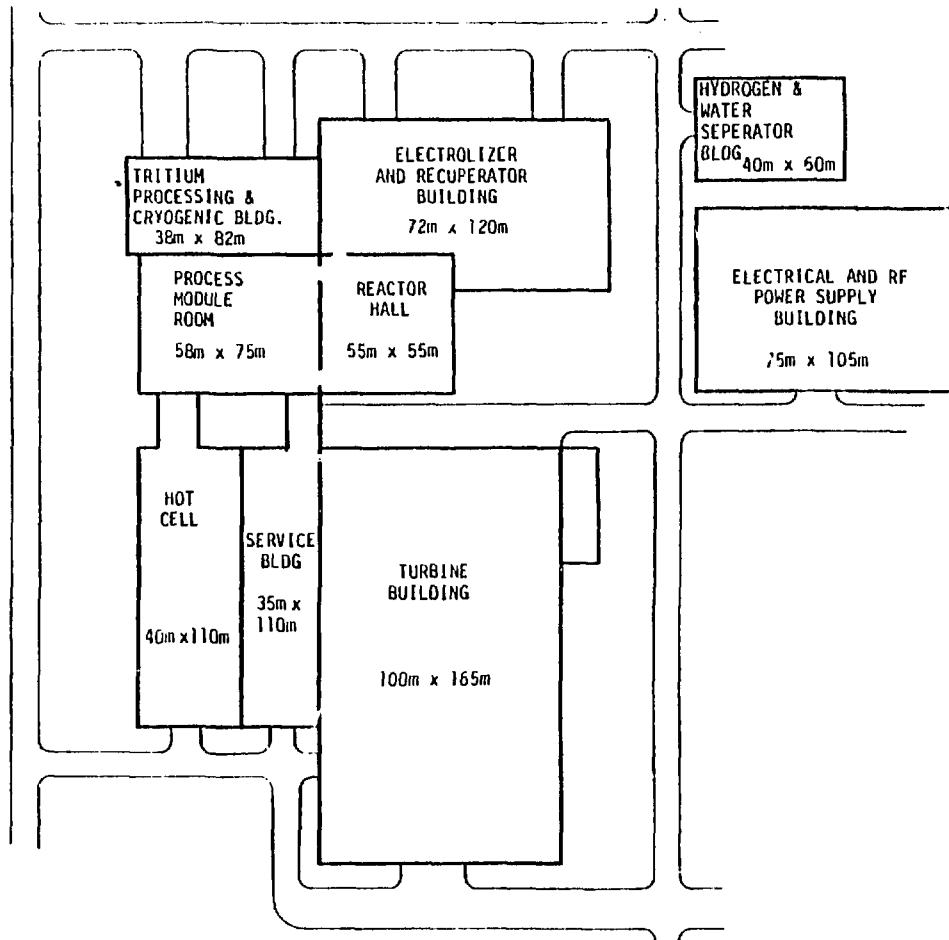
Hyfire Tokamak Site Plan
